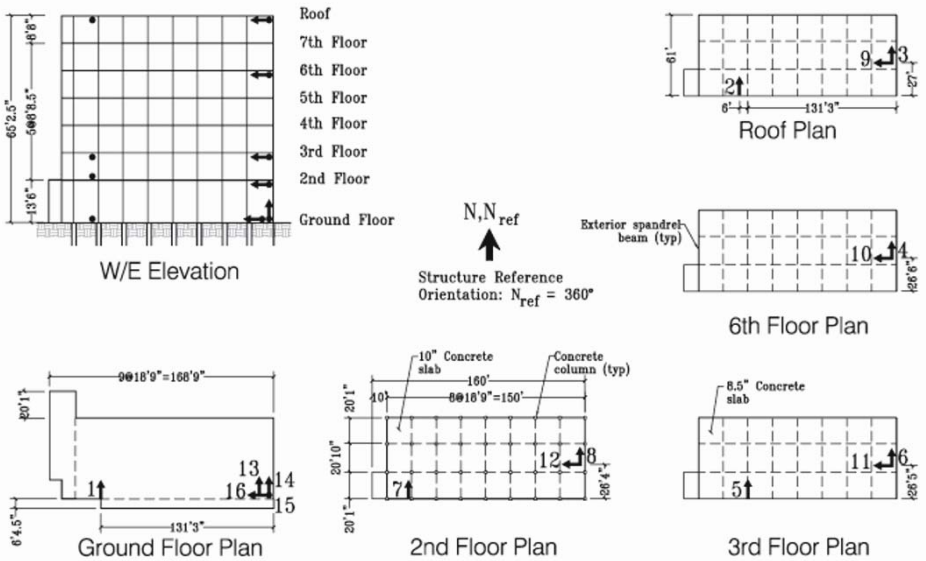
Sketch and sensor layout for the Van Nuys 7 Story Hotel
